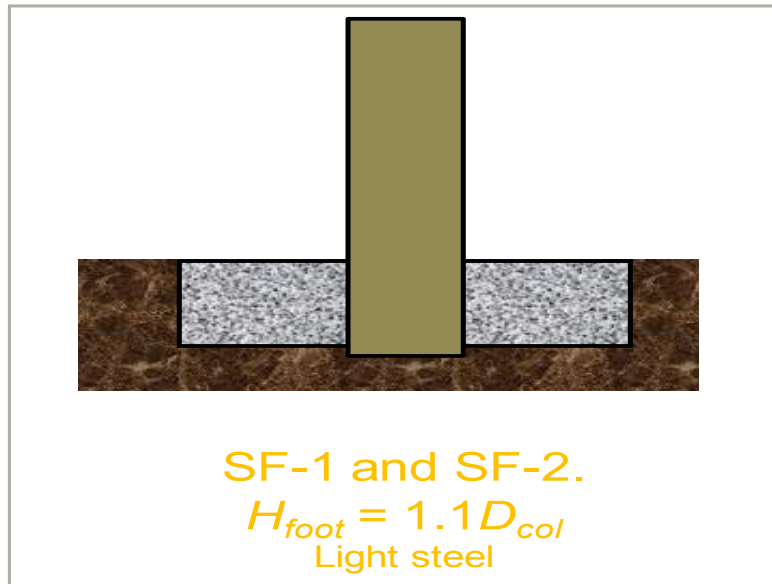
Model of a precast column model embedded in CIP footing at the University of Washington
